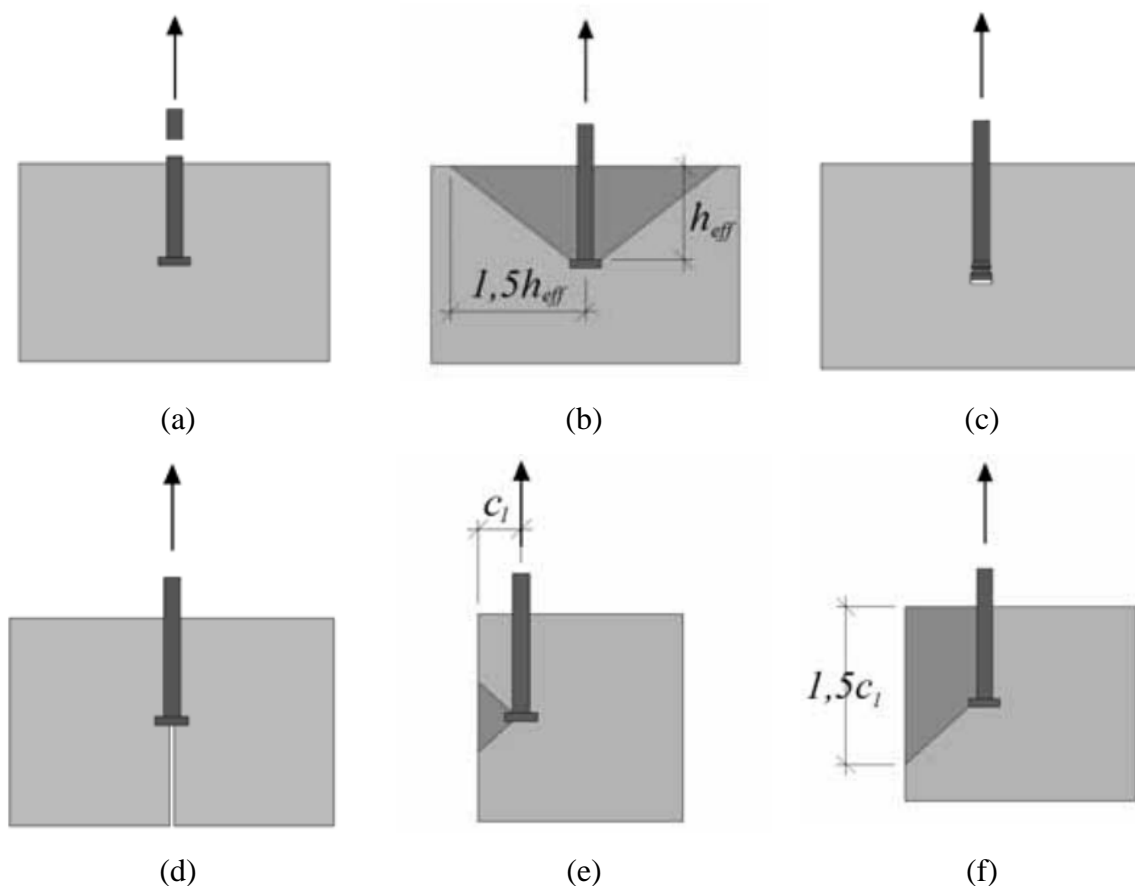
Failure modes observed for anchors for tension in concrete from Kuhlmann et al. [126]: steel failure (a), concrete cone failure (b), pull-out failure (c), splitting failure (d), local blow-out failure (e), steel failure (f).
